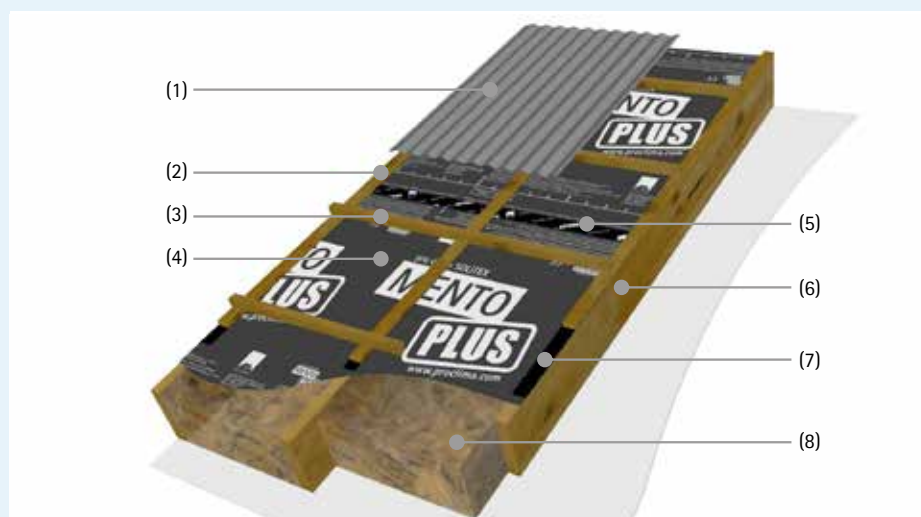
In a skillion roof, the ventilated cavity should be created between the underside of the roof cladding and the roof membrane. The membrane is placed directly on top of, and in contact with the insulation. It's separated from the roof cladding by battens and counter battens. *Specific products may vary. (1) Roof sheeting (medium colour), (2) Counter batten, (3) Fixing batten, (4) SOLITEX MENTO®, (5) TESCOX EXTORA® (Weathertight sealing tape), (6) Roof rafter, (7) TESCOX® NAIDECK (Double sided self-sealing strip), (8) Fibrous insulation
